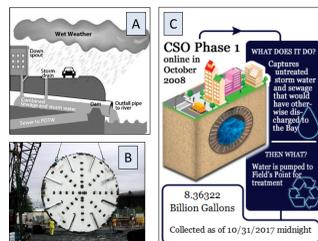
(A) Diagram of combined sewer system. (B) Tunnel boring head used in Phase 1 tunnel construction. (C) Online (narrabay.com) tracking of gallons stored by tunnel for advanced treatment.
